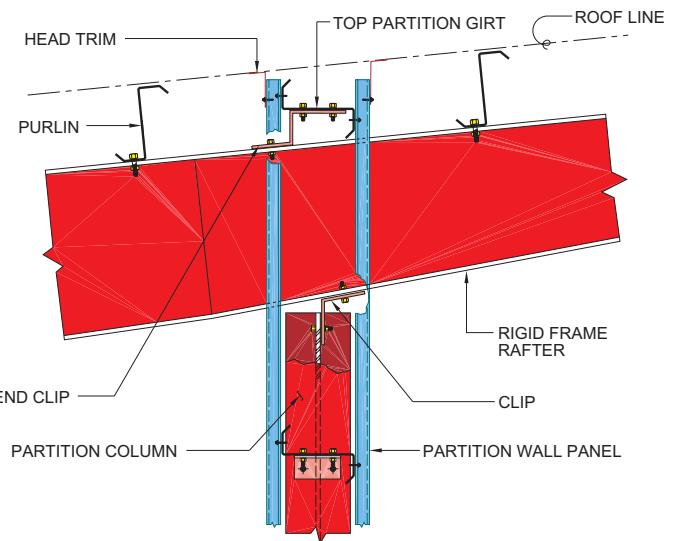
DETAIL-G : PARTITION COLUMN CONNECTION AT GIRT
